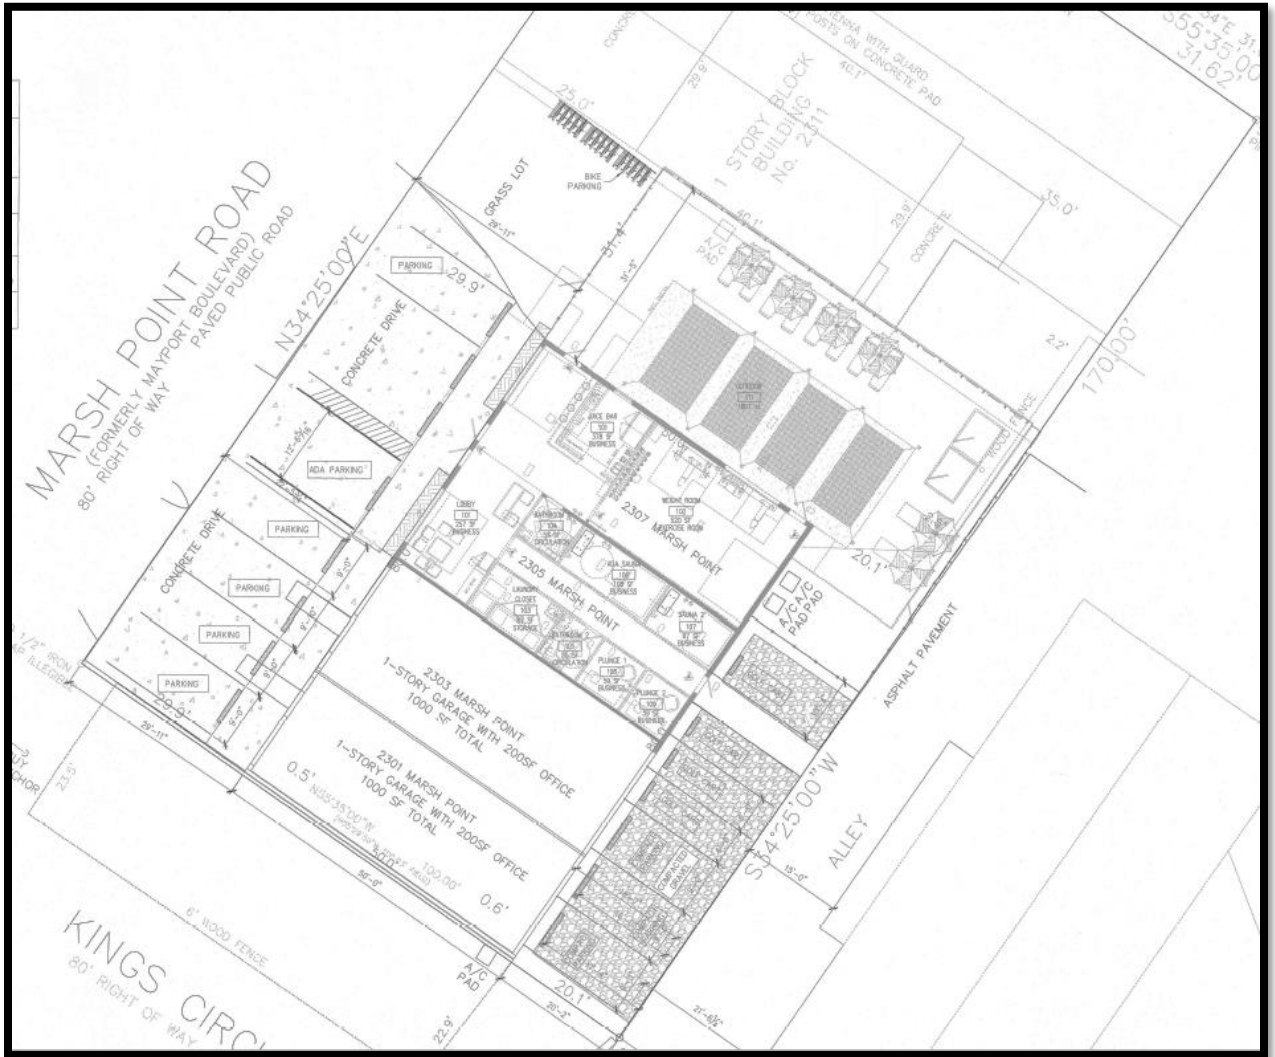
Proposed Immerse Site Plan, 2301, 2303, 2305, and 2307 Marsh Point Rd, Neptune Beach, FL
